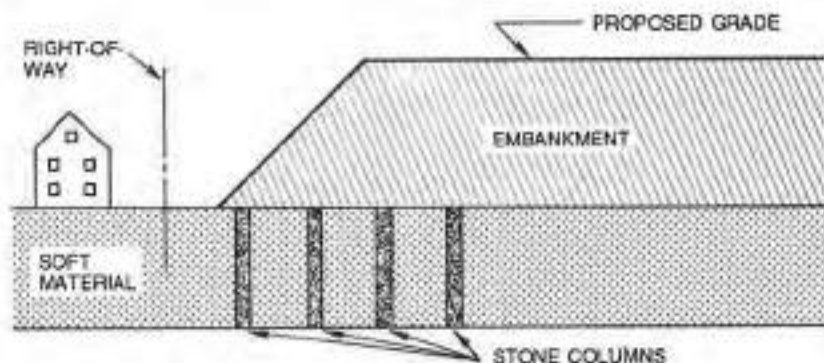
Stone columns used to stabilize highway embankment (courtesy New York State Department of Transportation).
